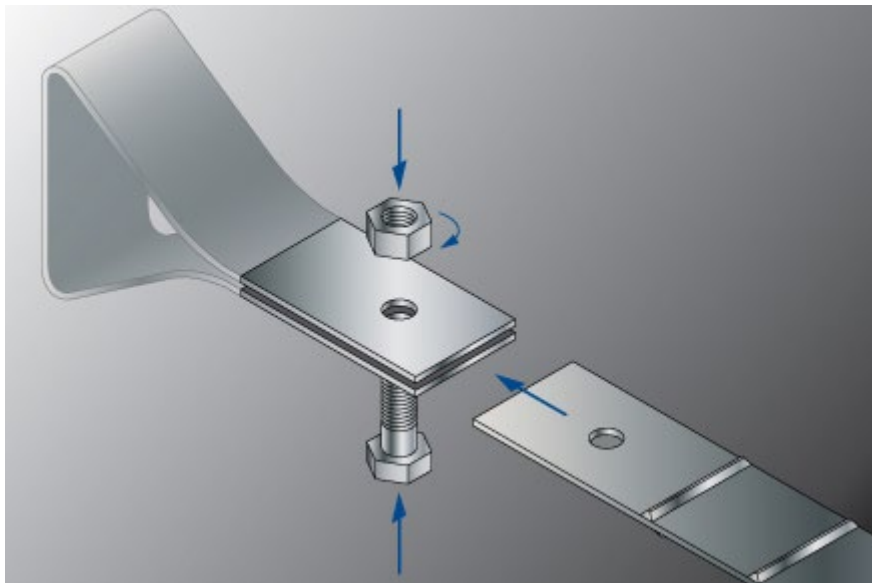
Detail of connection between facing and steel strip (Reinforced Earth, 2021).
